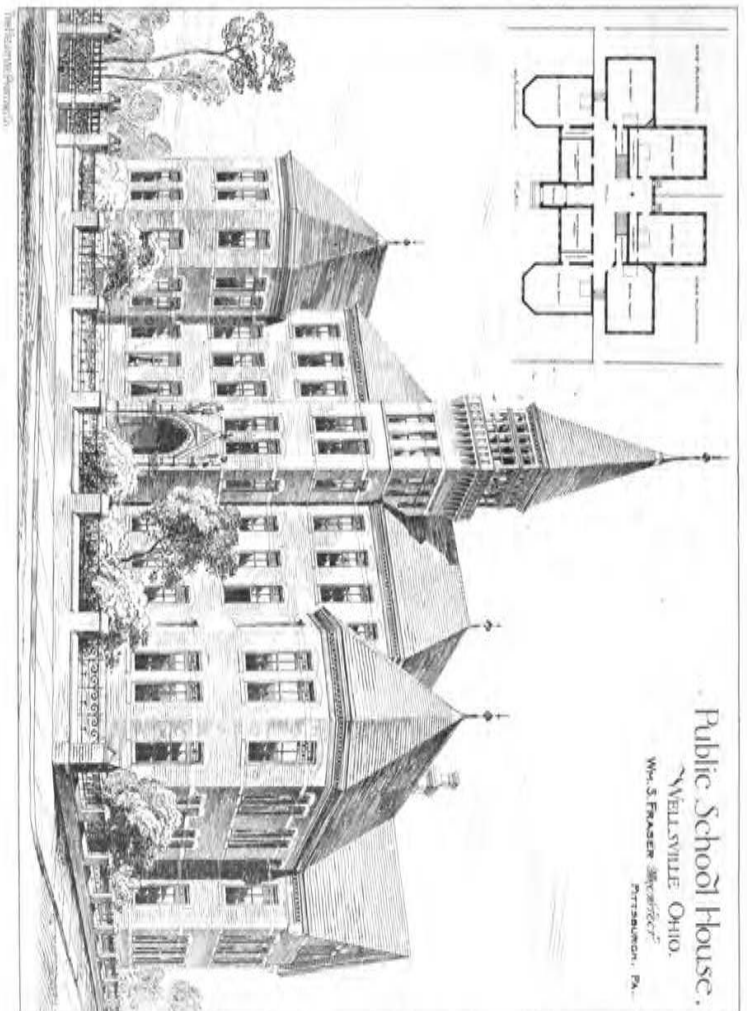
Fraser's rendering of Wellsville High School, *The American Architect and Building News*, June 12, 1880.
